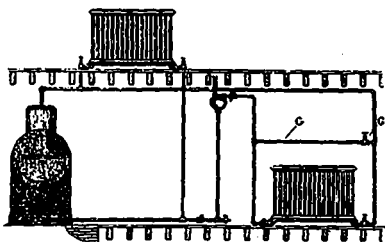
SHOWING THE BOILER AND SYSTEM OF PIPES AND RADIATORS, A PART OF THE SYSTEM BEING ABOVE THE WATER LEVEL IN THE BOILER AND A PART BELOW IT.
